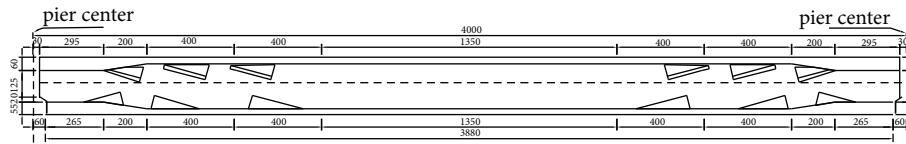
Longitudinal section of 40 m box girder (cm).
